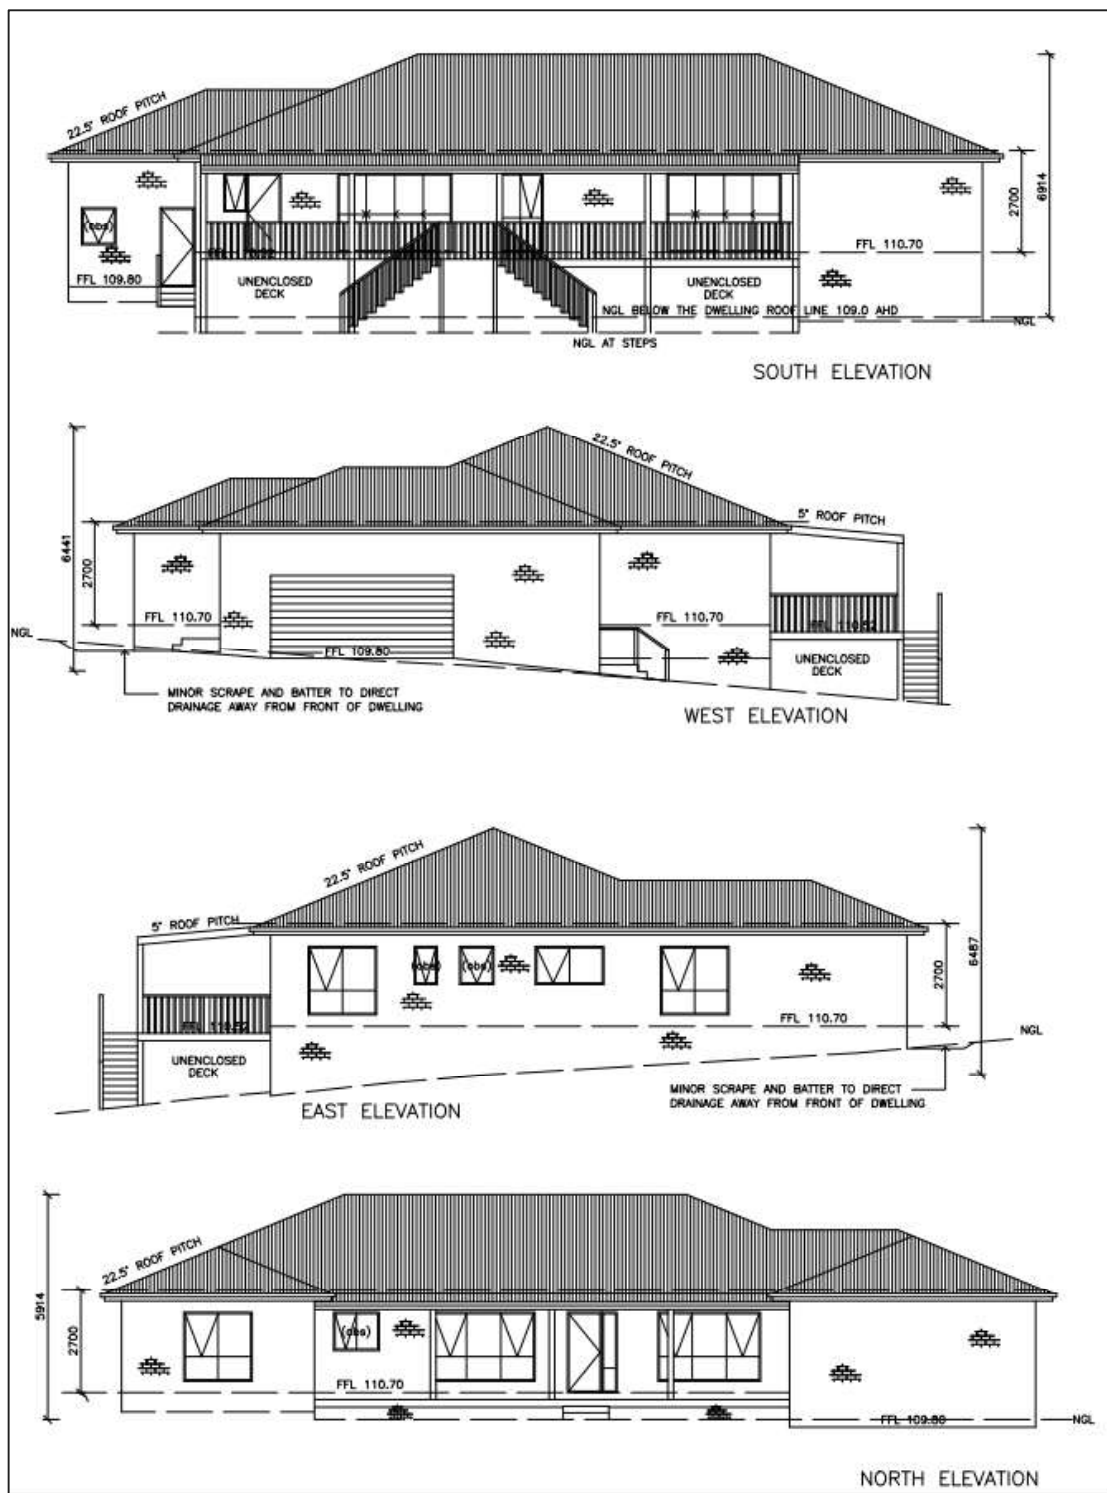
Proposed elevations (Source: Applicant submission Philip Harvey and associates)
